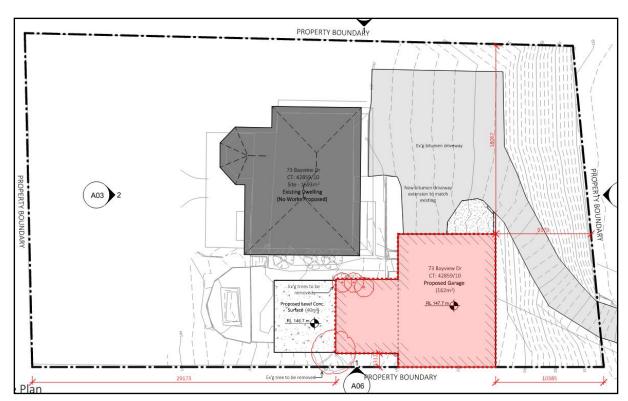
Excerpt of the submitted Site Plan showing the location of the proposed outbuilding.
